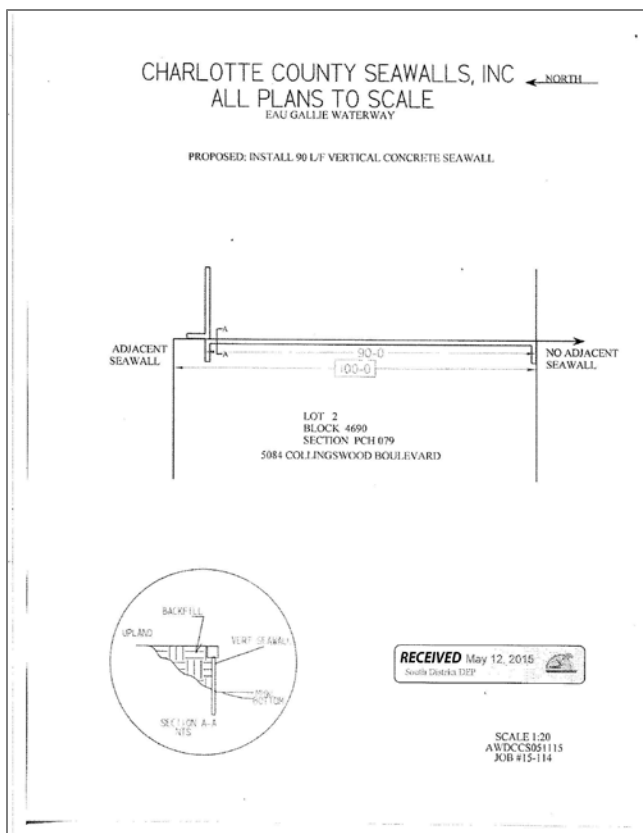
Proposed plans for 100-lin-ft seawall installation (© 2015 L&T Engineering, Inc.)
